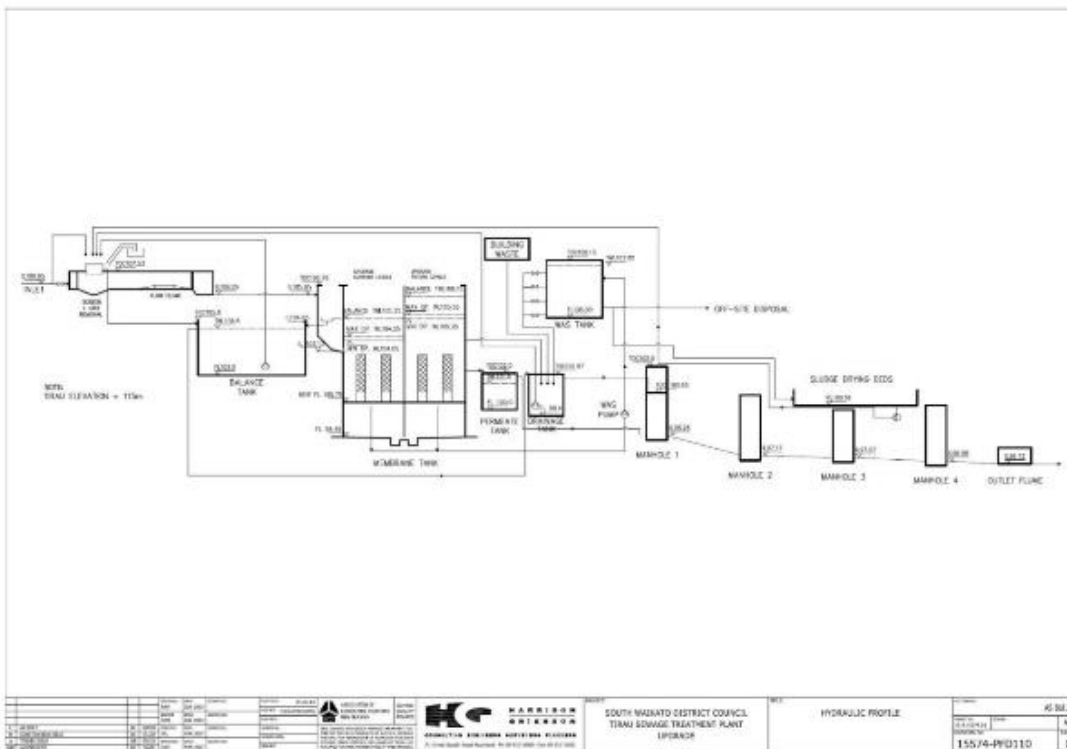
Tirau Sewage Treatment Plant Hydraulic
